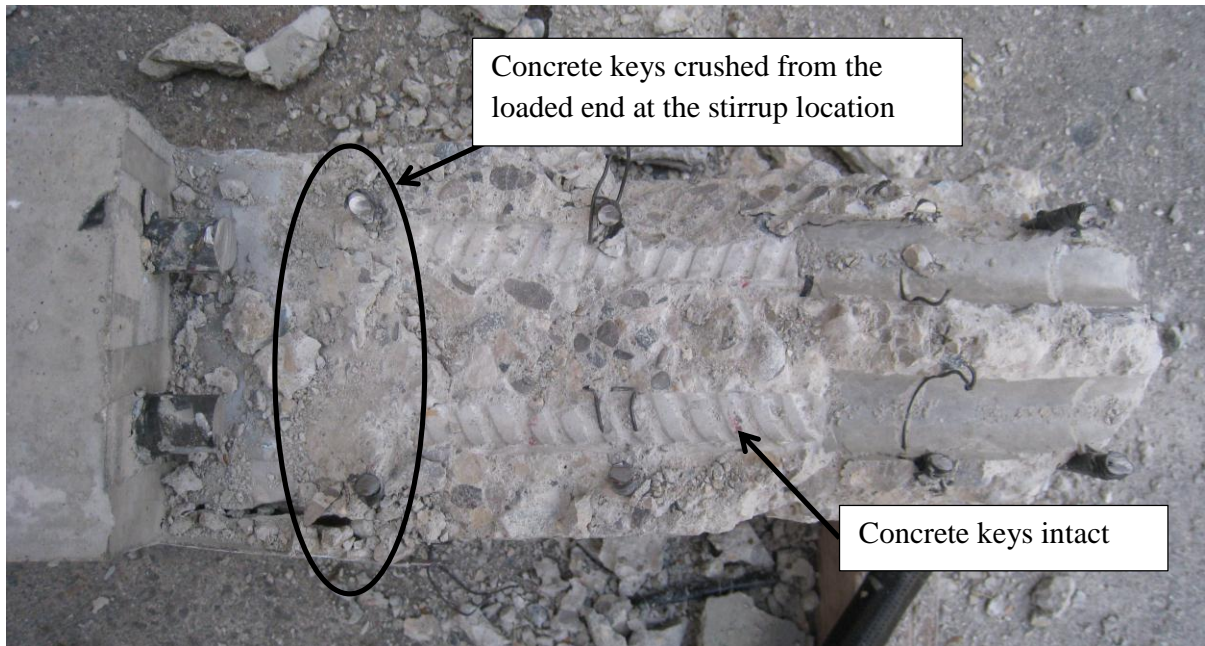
Beam M-200-U-n-2 after failure and removing the reinforcing bars to examine the concrete keys. The beam was turned upside down.
